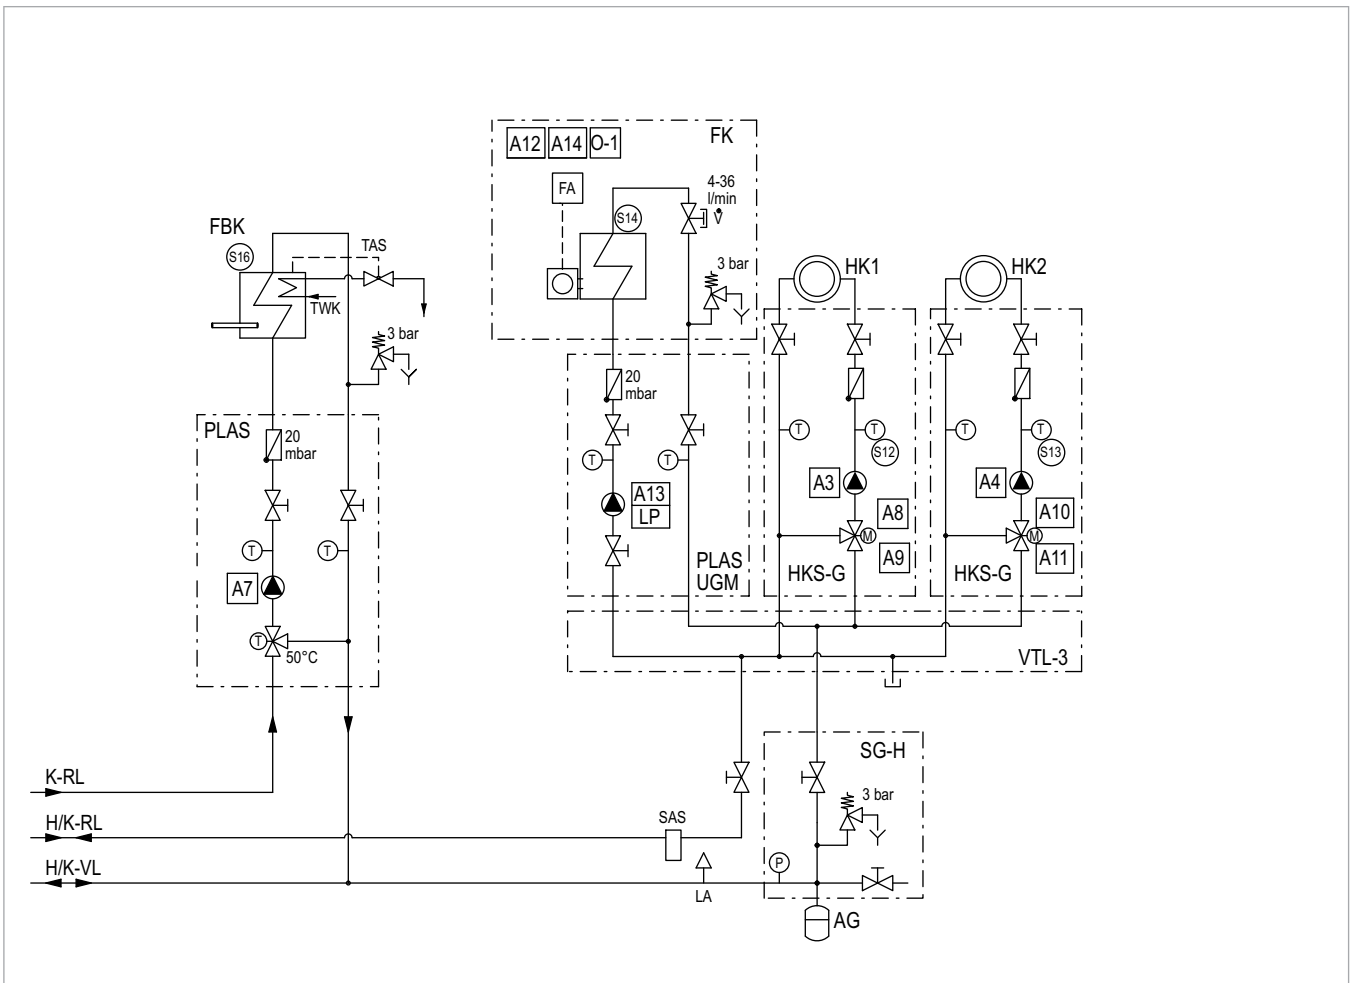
SolvisMax Solo with third-party boiler, solid fuel boiler and two mixed heating circuits – Part 2
